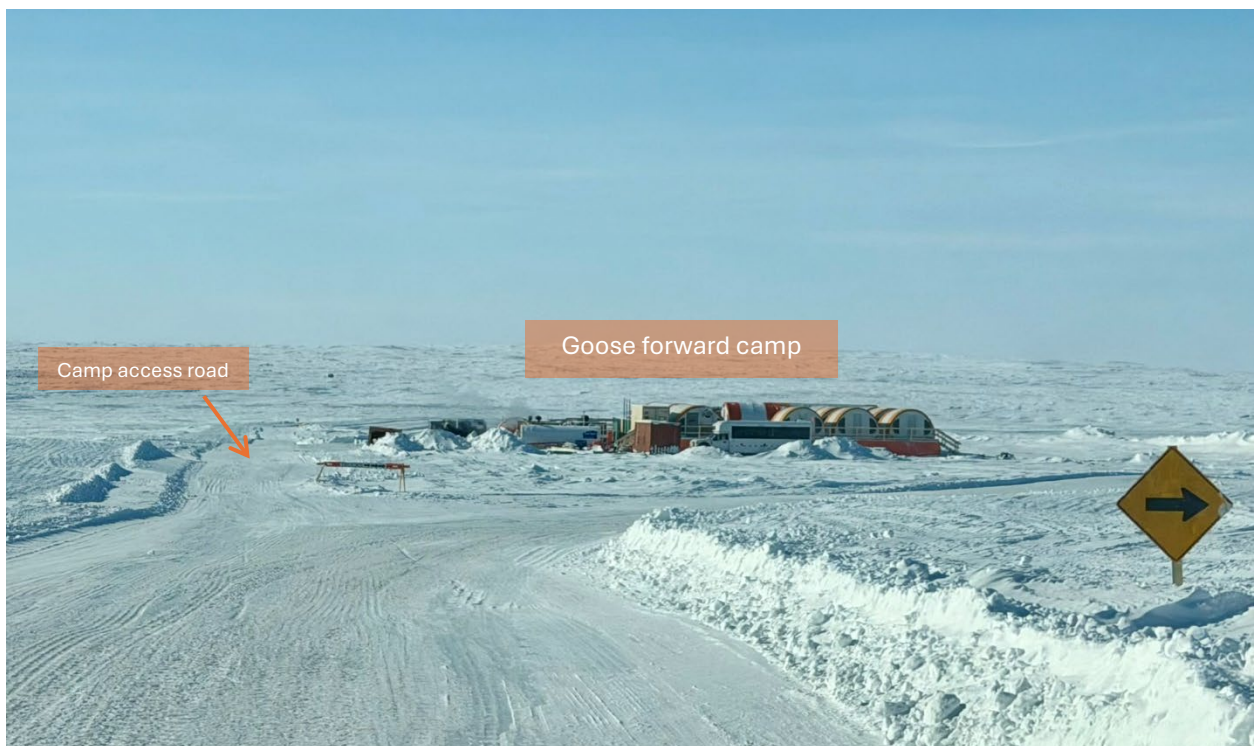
View of Goose Forward Camp area showing Winter Ice Road alignment and camp access road
